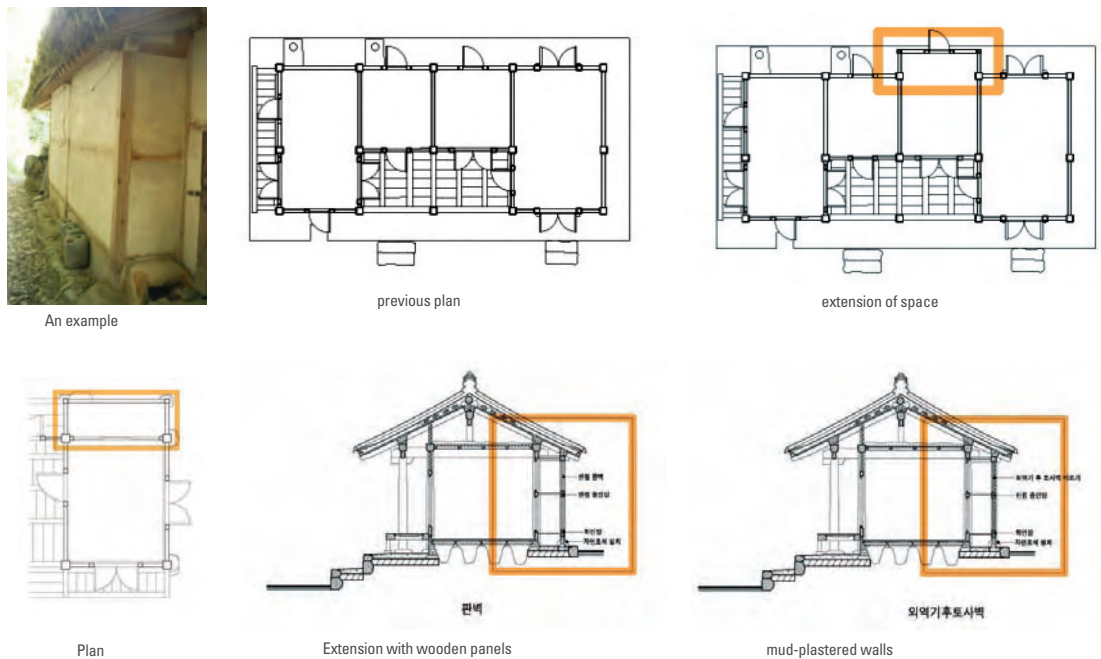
Design Guidelines for Modification of Layout and Structure (extension of space)
